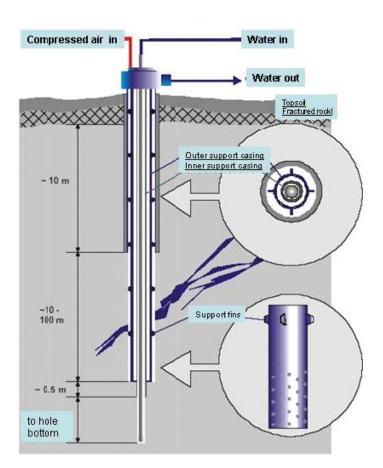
In the telescopic part of the drill hole a temporary installation is made with casing tubes for support and alignment and equipment for air-lift pumping. In the uppermost part the return water discharge header is mounted. The water discharge is led to the settling containers.
